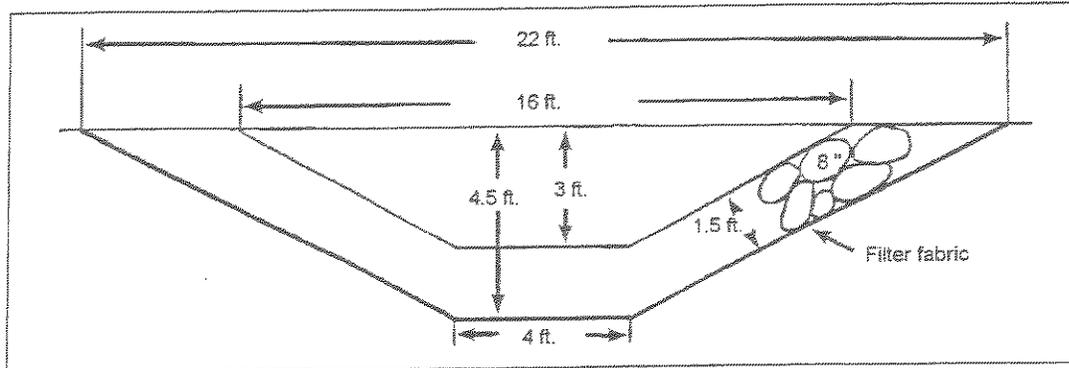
B. Example calculation of excavation for riprap and filter fabric in a channel. Note overcut requirements.
